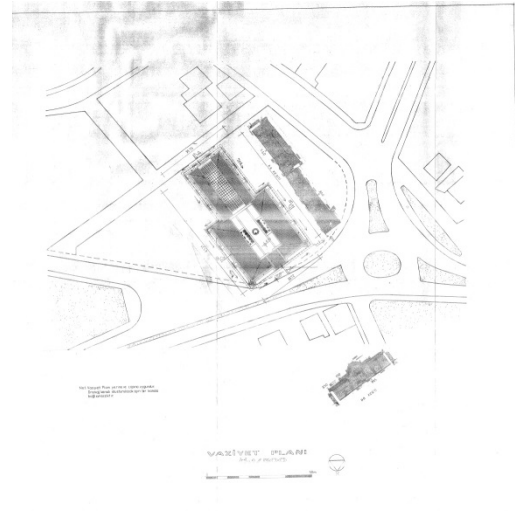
Pazar / Tokat Mahperi Hatun Caravanserai Site Plan
